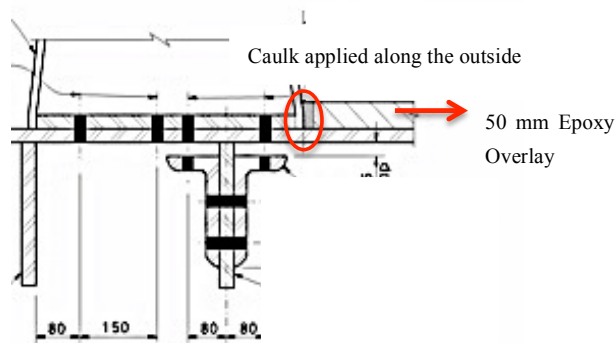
Connection between guardrail and steel orthotropic deck top plate [Ref.: Caltrans drawings 638/1204].
